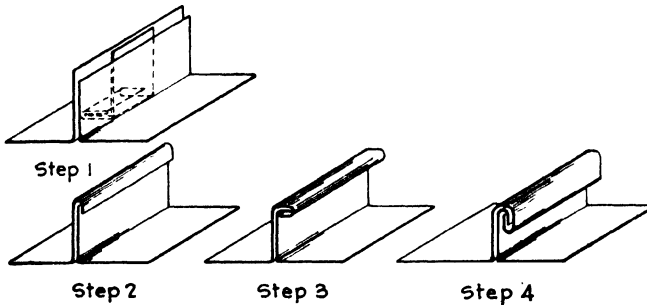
Standing Seam Roofing. (Courtesy Revere Copper and Brass, Inc.)
